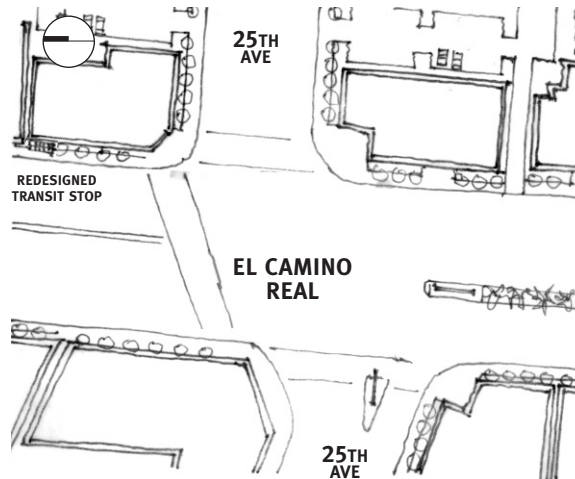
Potential private redevelopment at the 25th Avenue intersection, including additional sidewalk width, landscape setbacks, expanded corner plazas and redesigned transit stops.
